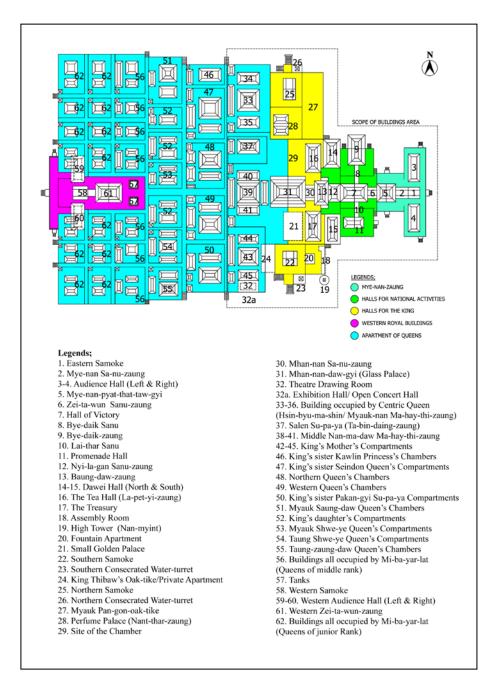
Layout Plan and Space Utilization of the Mandalay Old Palace
